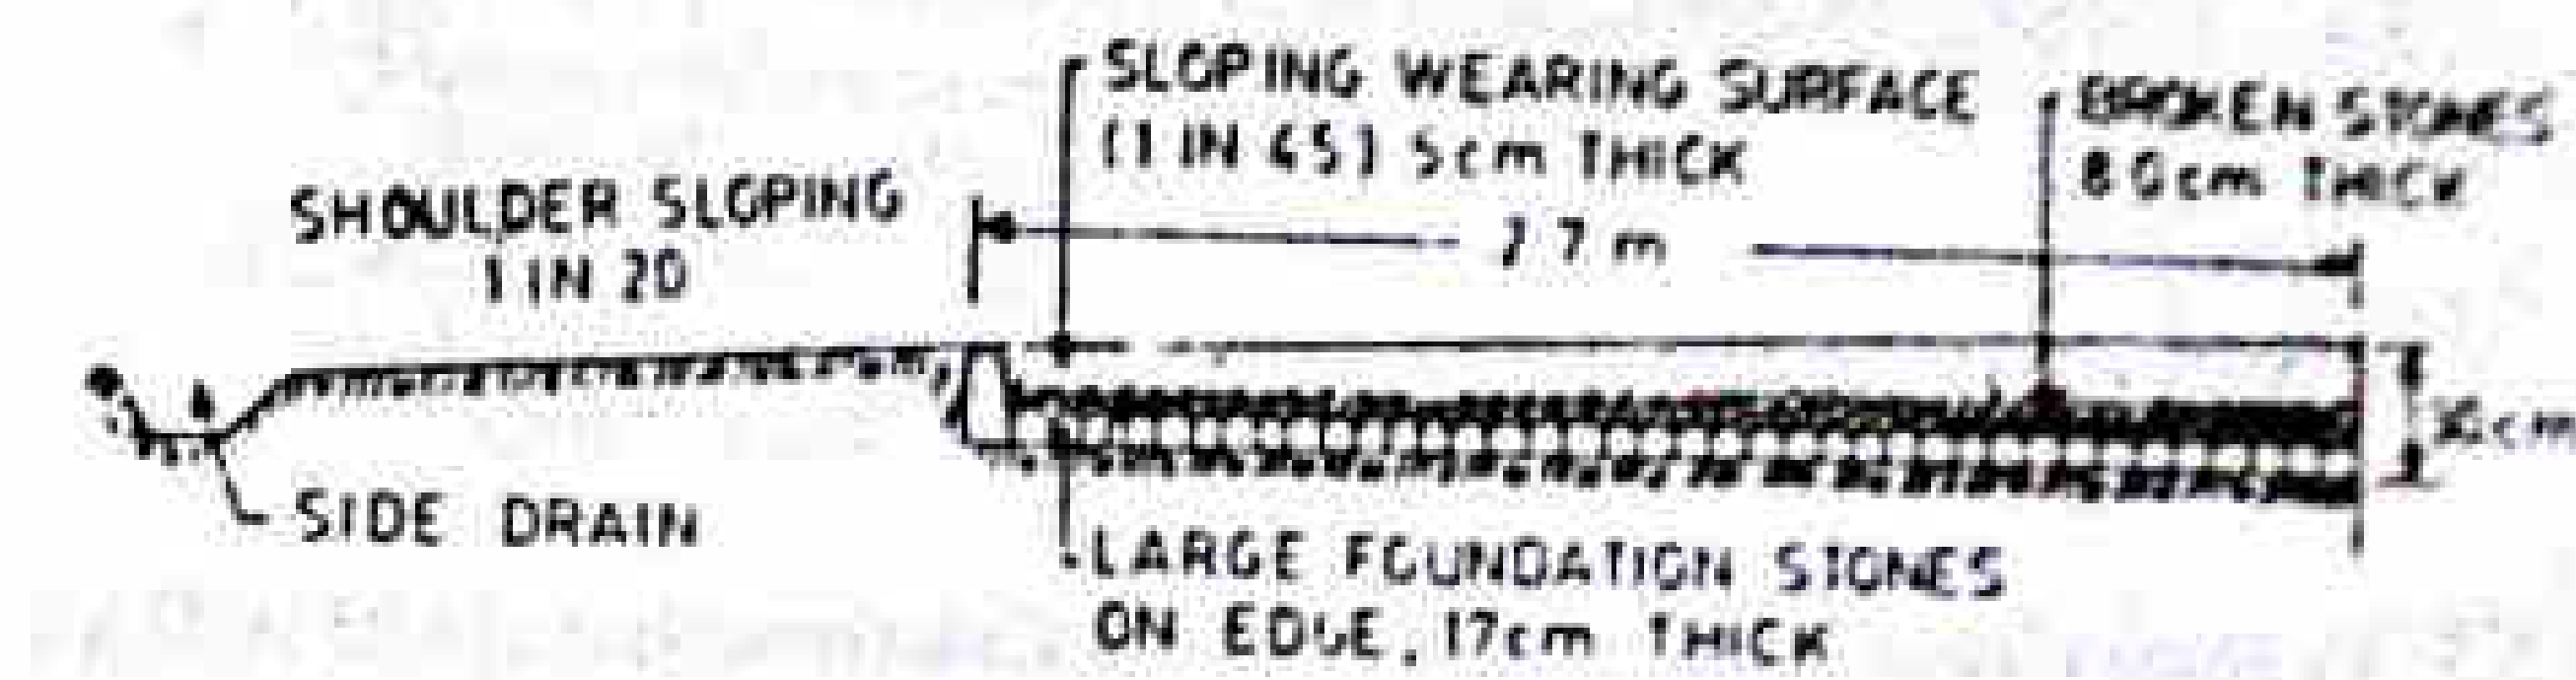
Typical Cross Section of Tresaguet's Construction (1775 A.D.)
